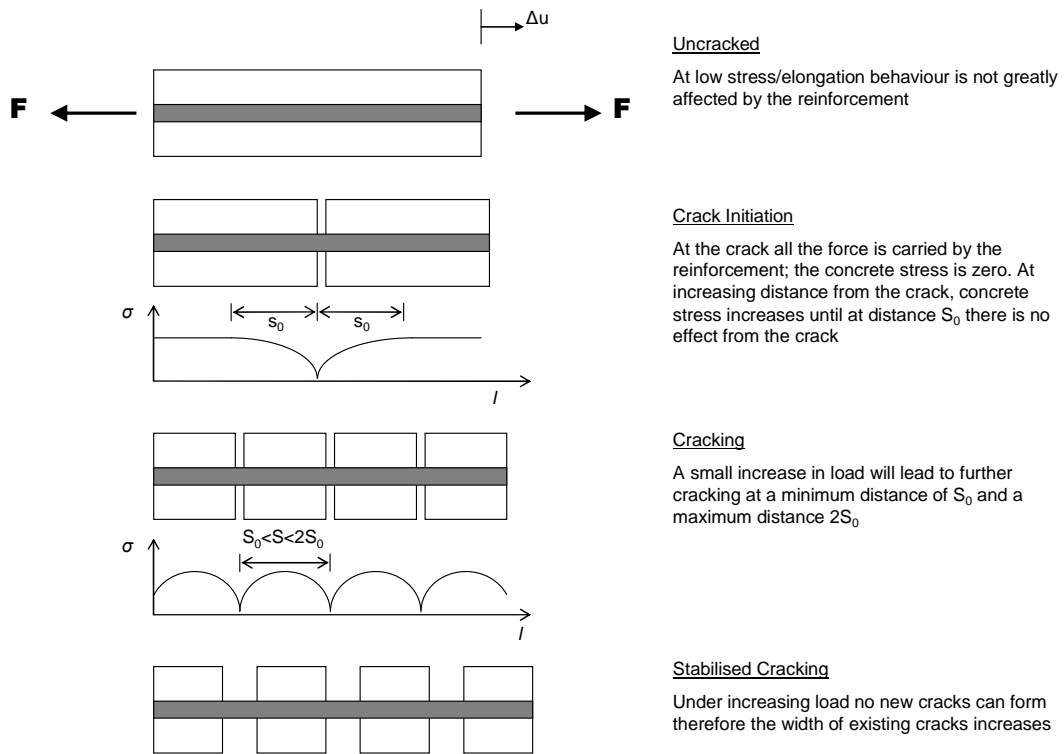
Series of events in cracking of reinforced concrete sections
